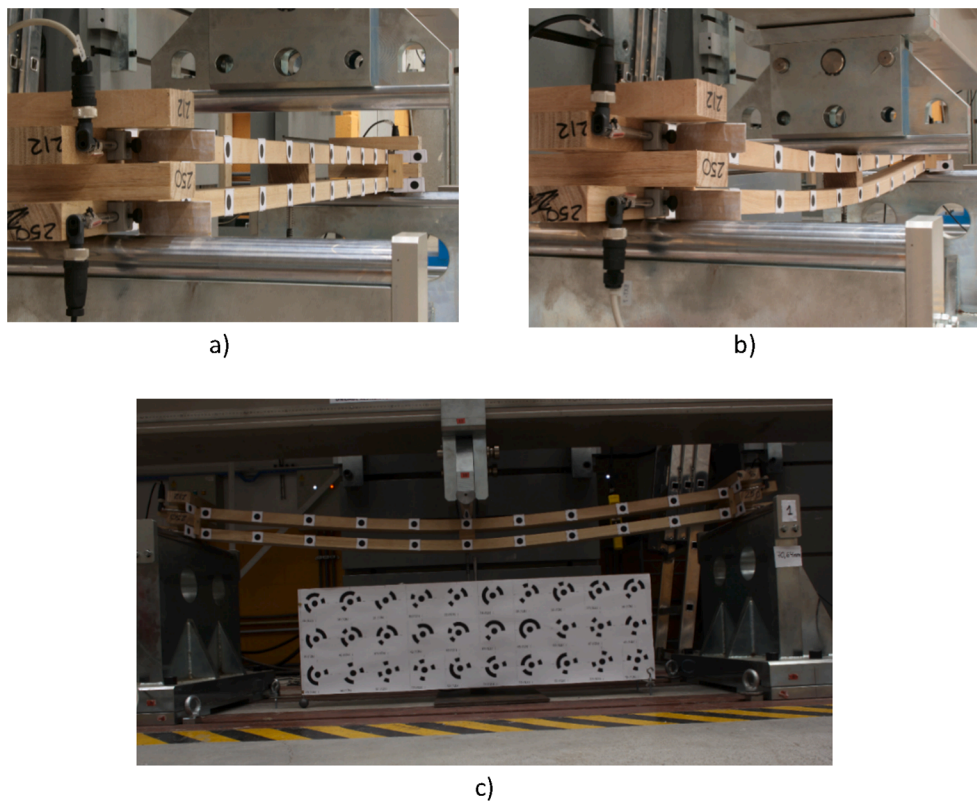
Photographed load status: (a) No load, (b) half-time between loading start and failure, and (c) maximum load before failure.
